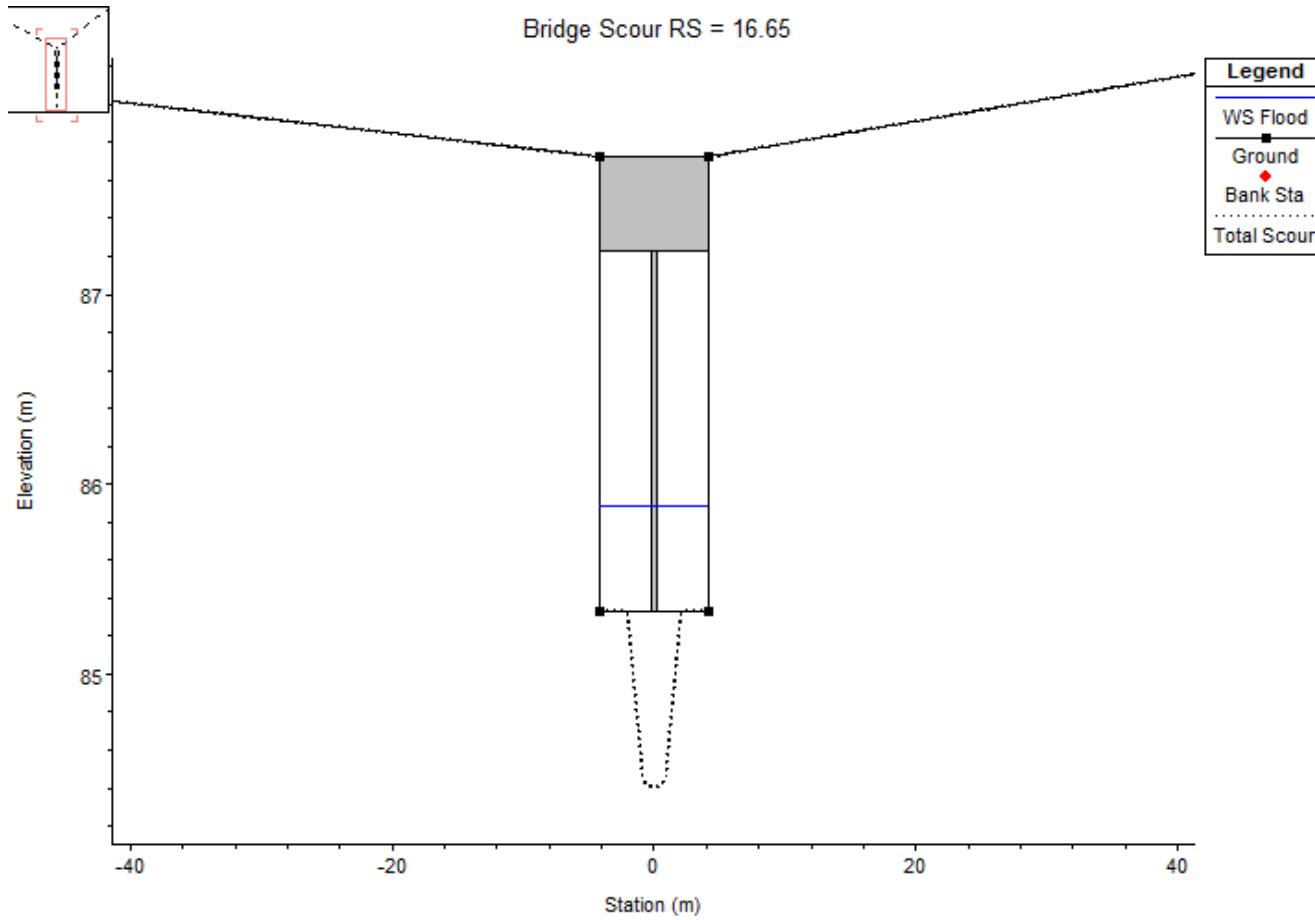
Scouring at bridge of Section 10 on Bostancı Creek in cross-sectional view
